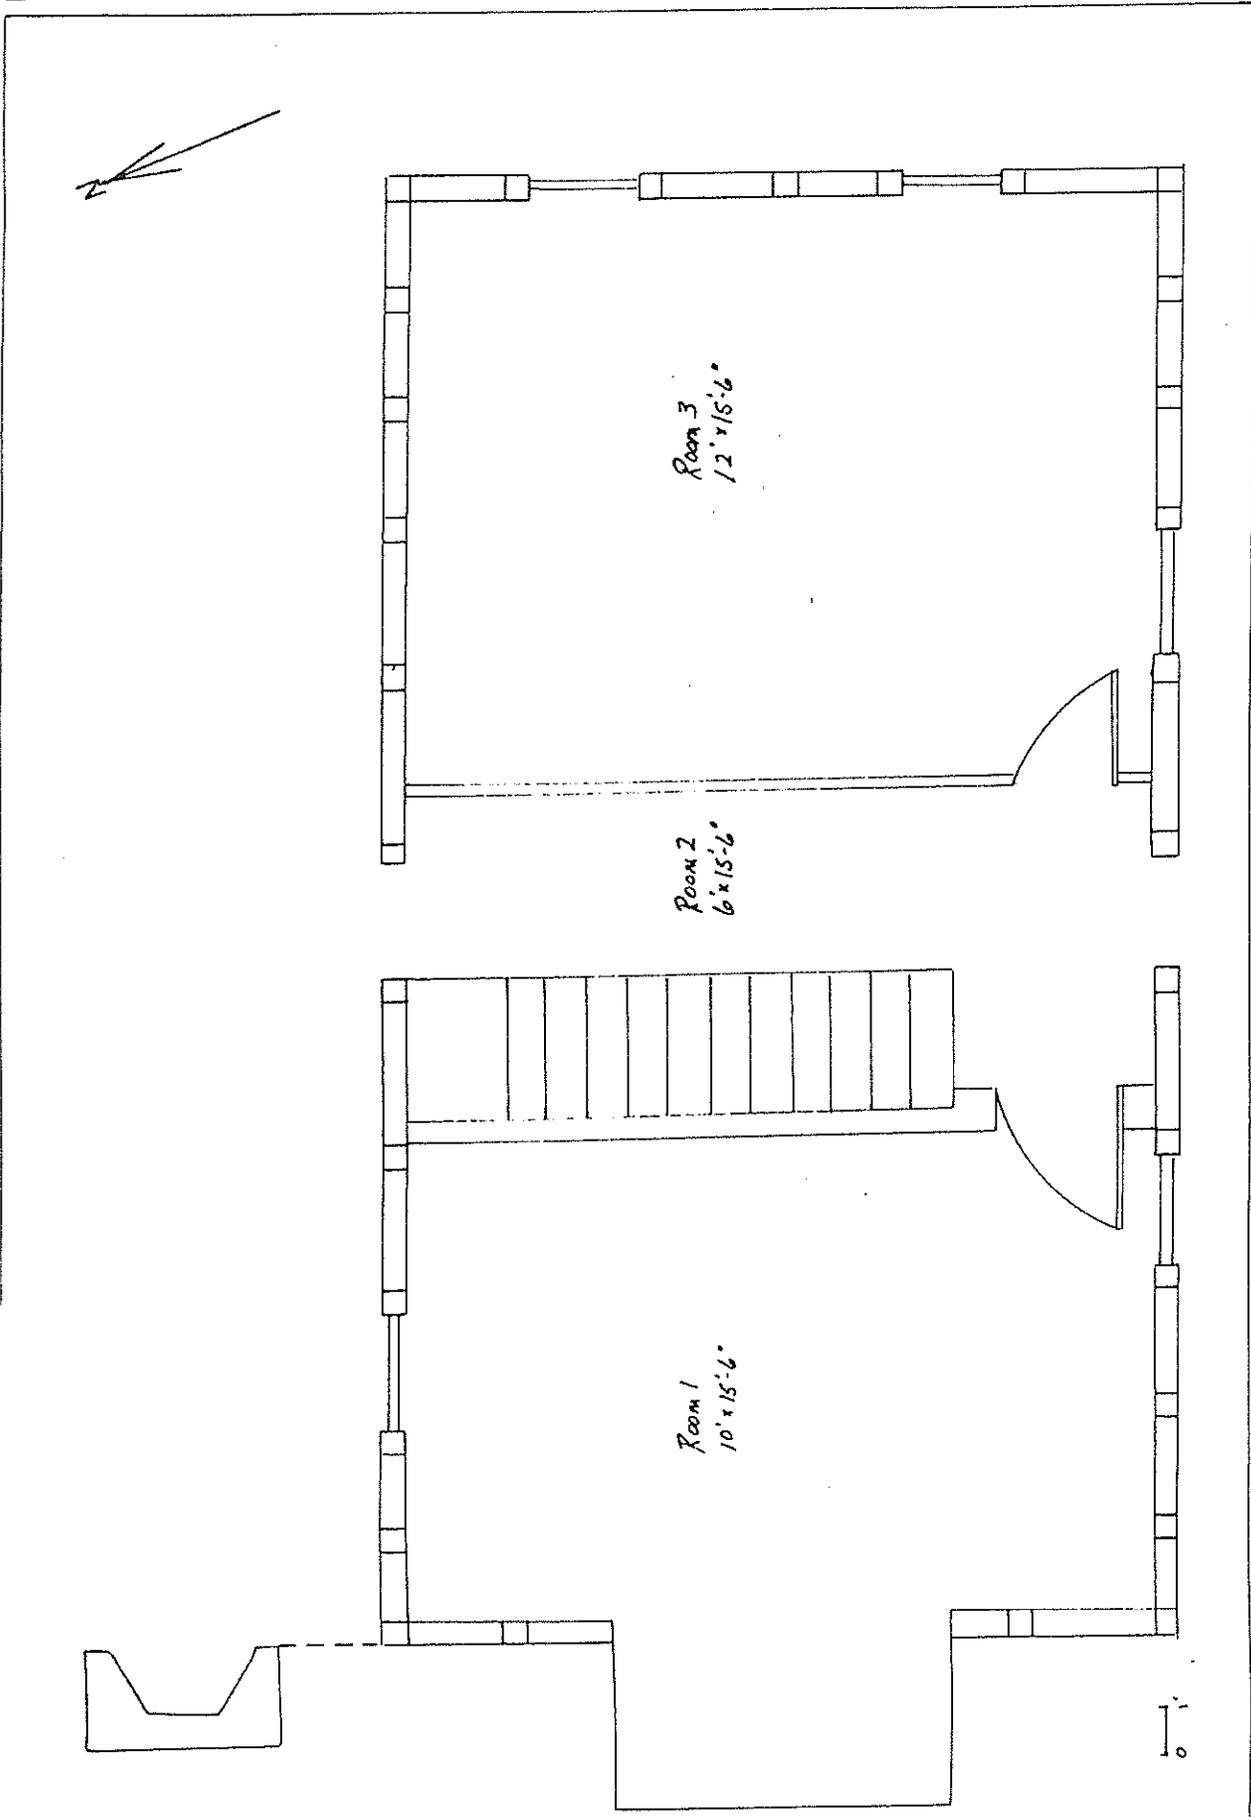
Garvin House interior ground floor plan (K. Seyalioglu 2003)
